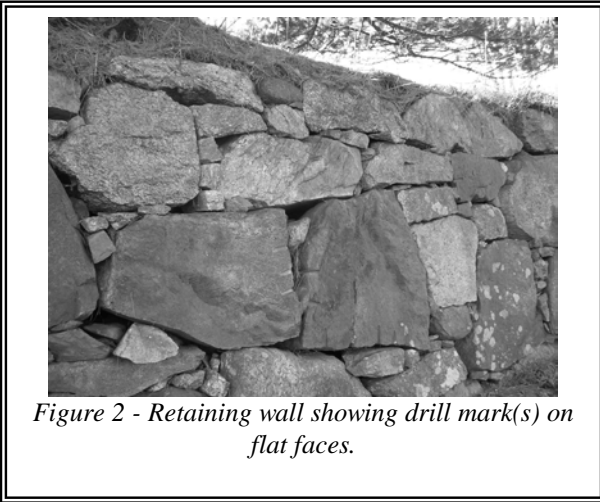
Retaining wall showing drill mark(s) on flat faces.
